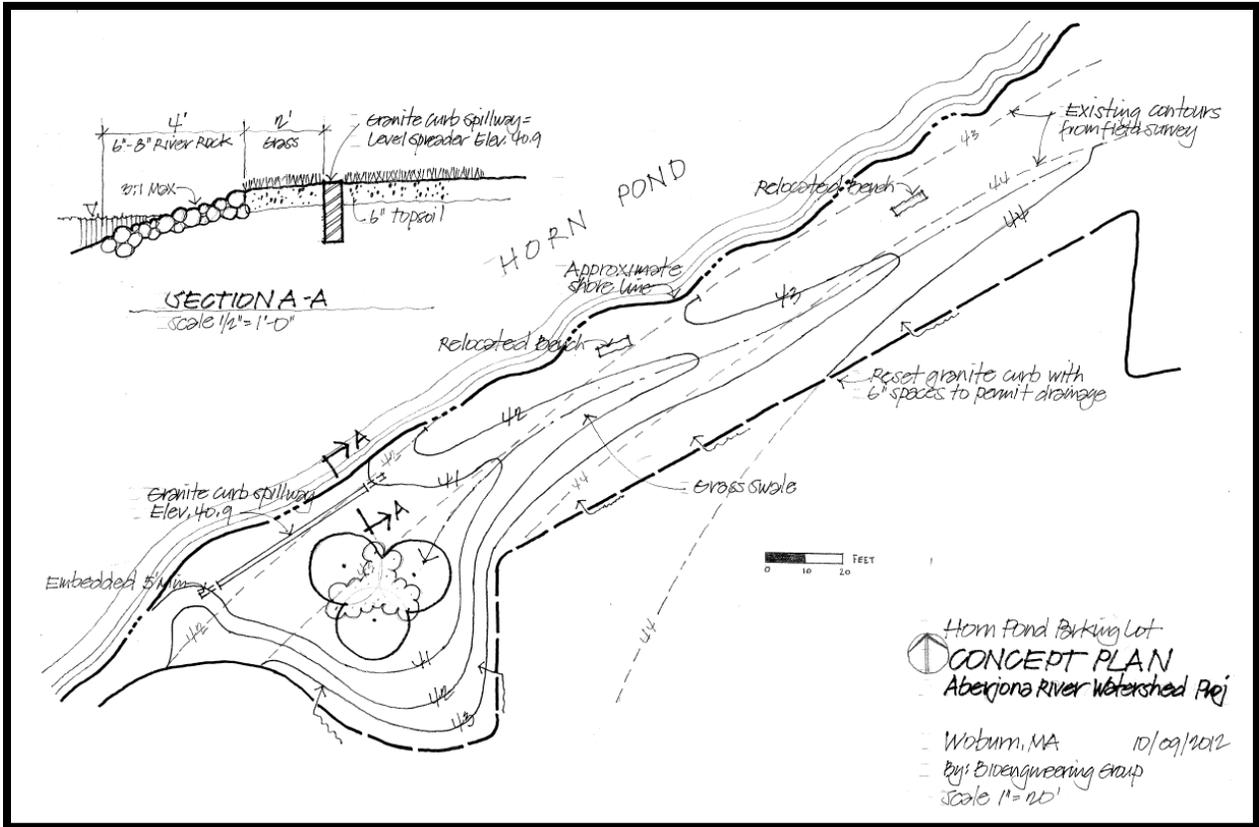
Concept Plan for Rain Garden at Horn Pond Parking Lot
